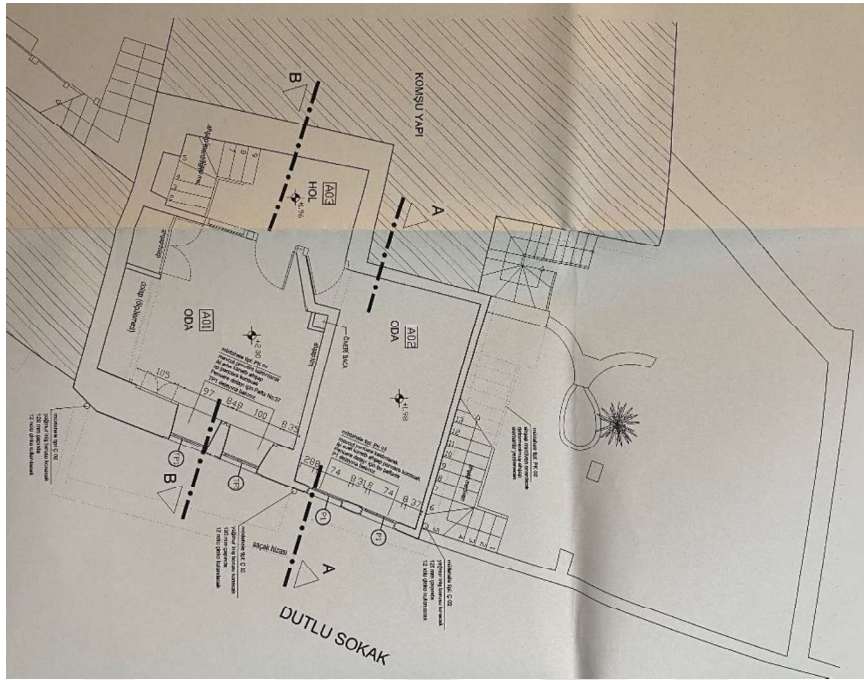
Registered buildings – Mezzanine Floor: 1/50
